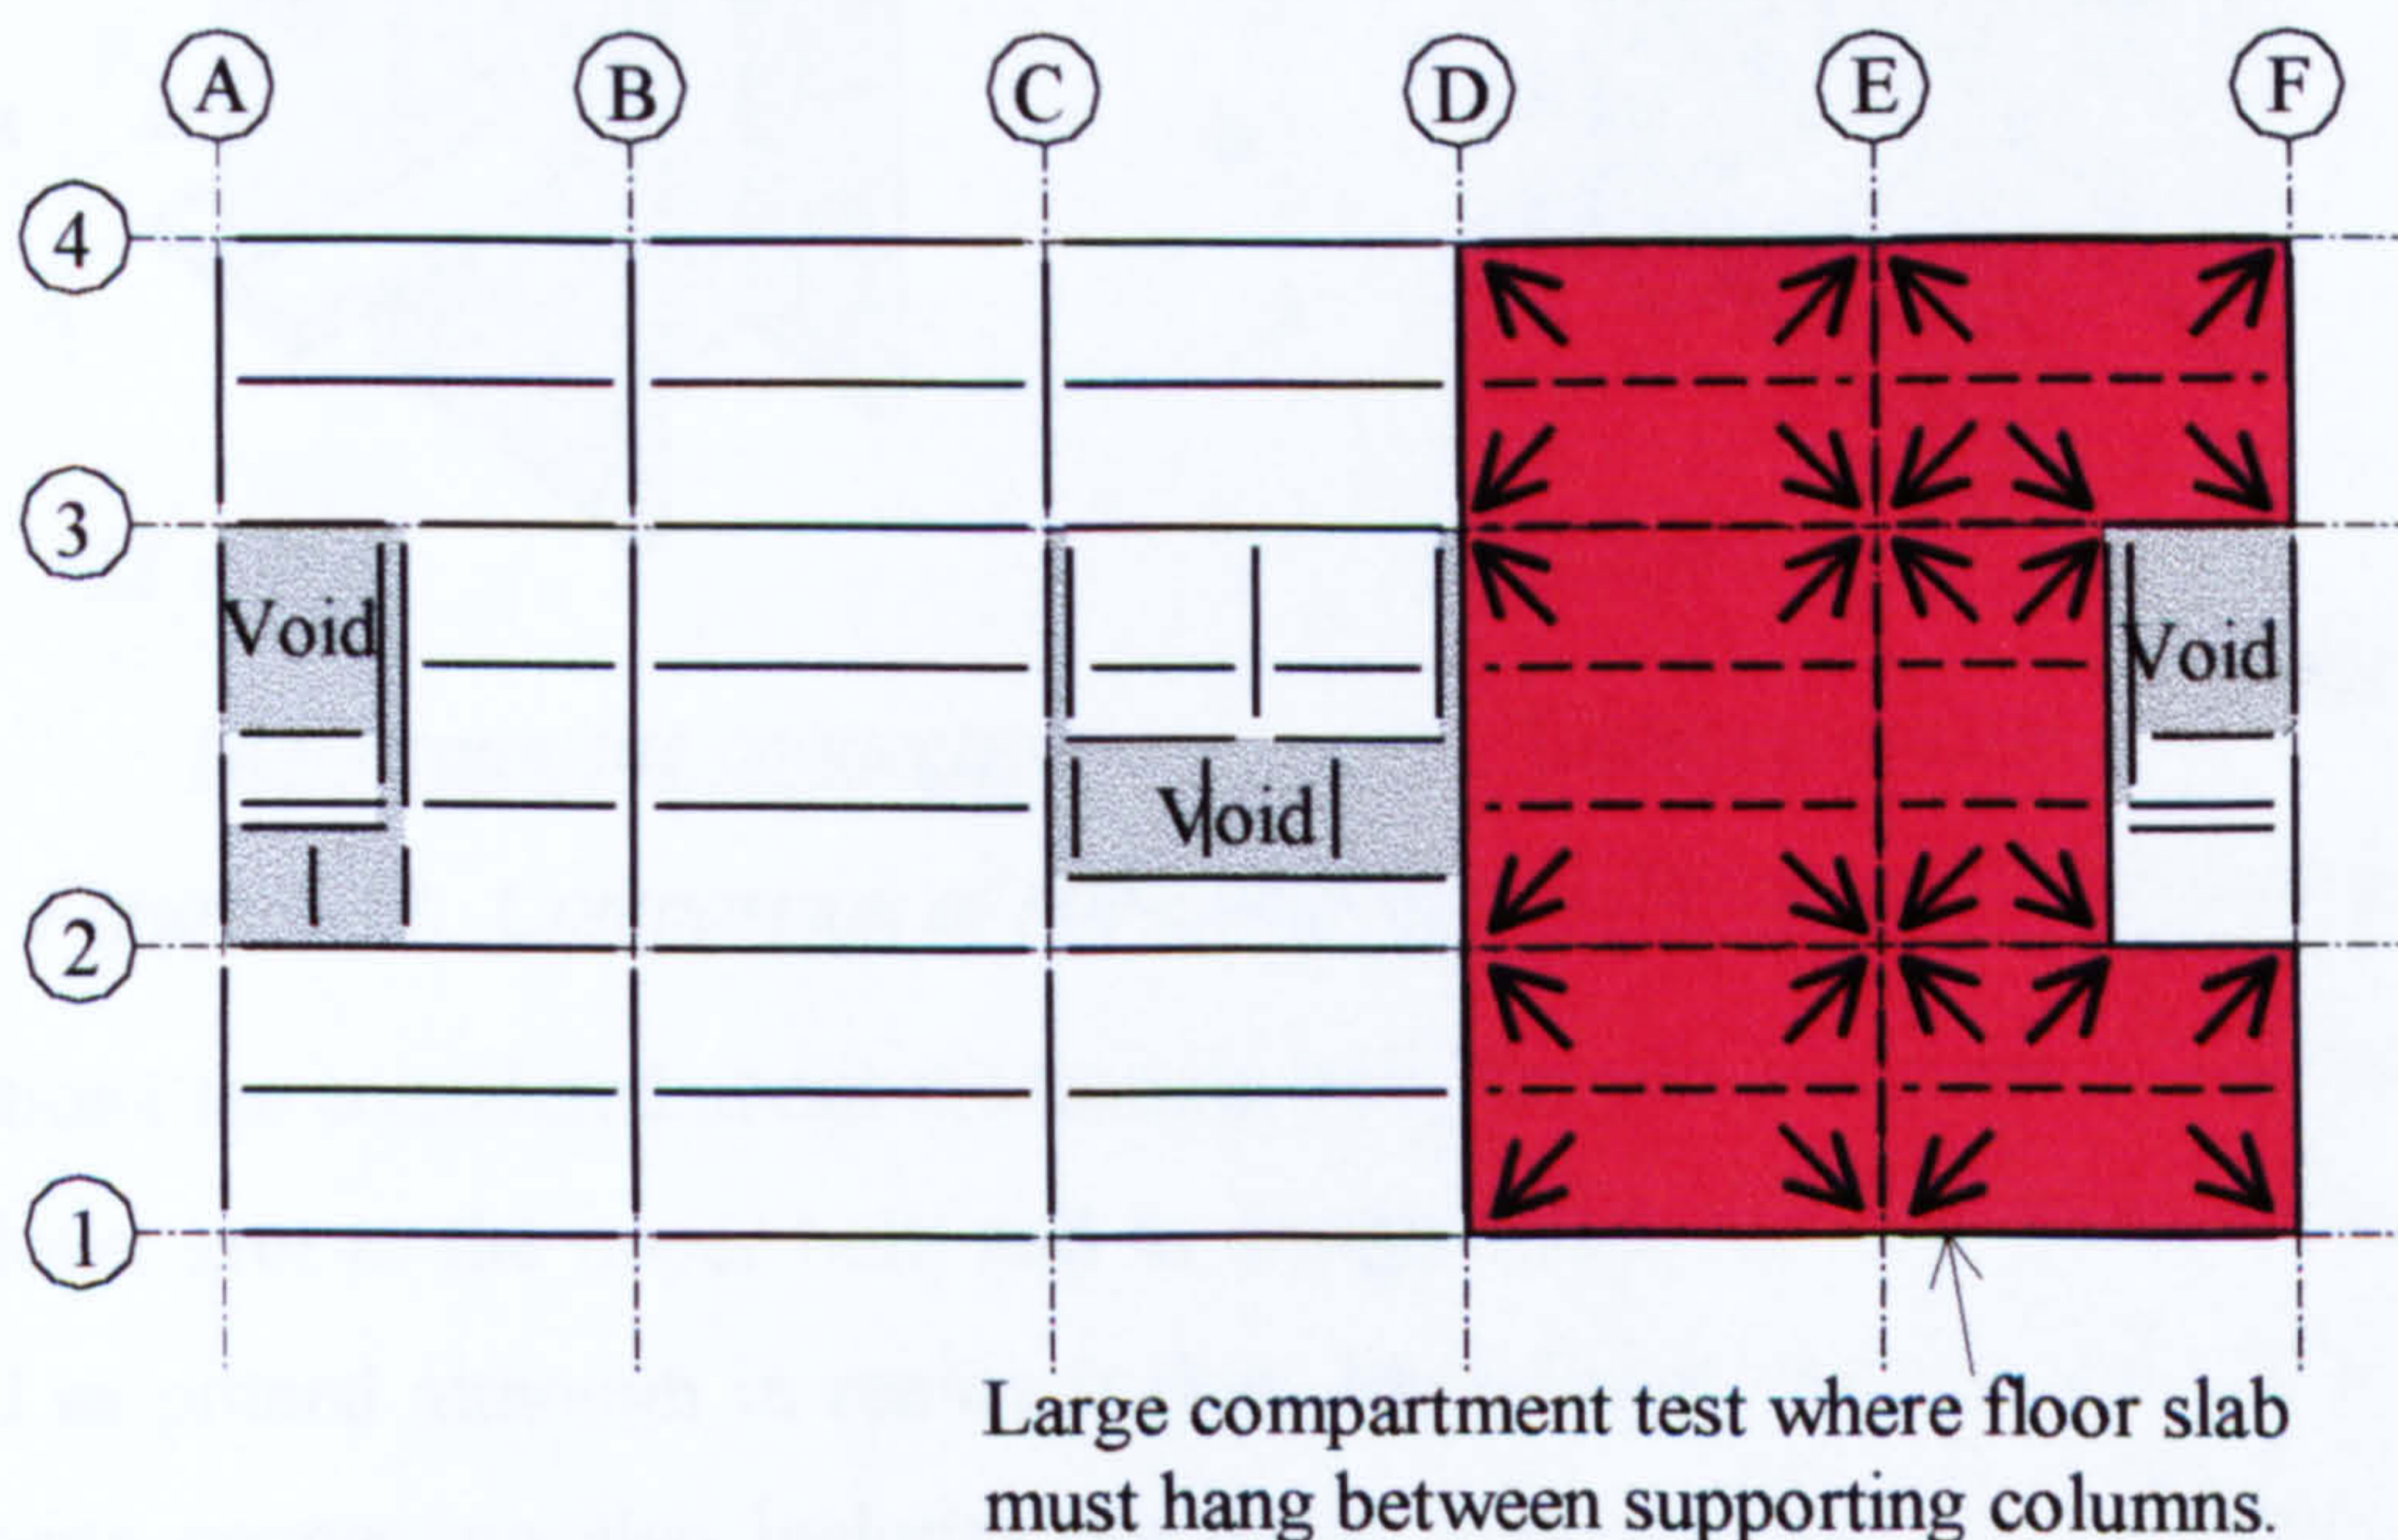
Schematic drawing of an example of a floor slab spanning between adjacent beams
